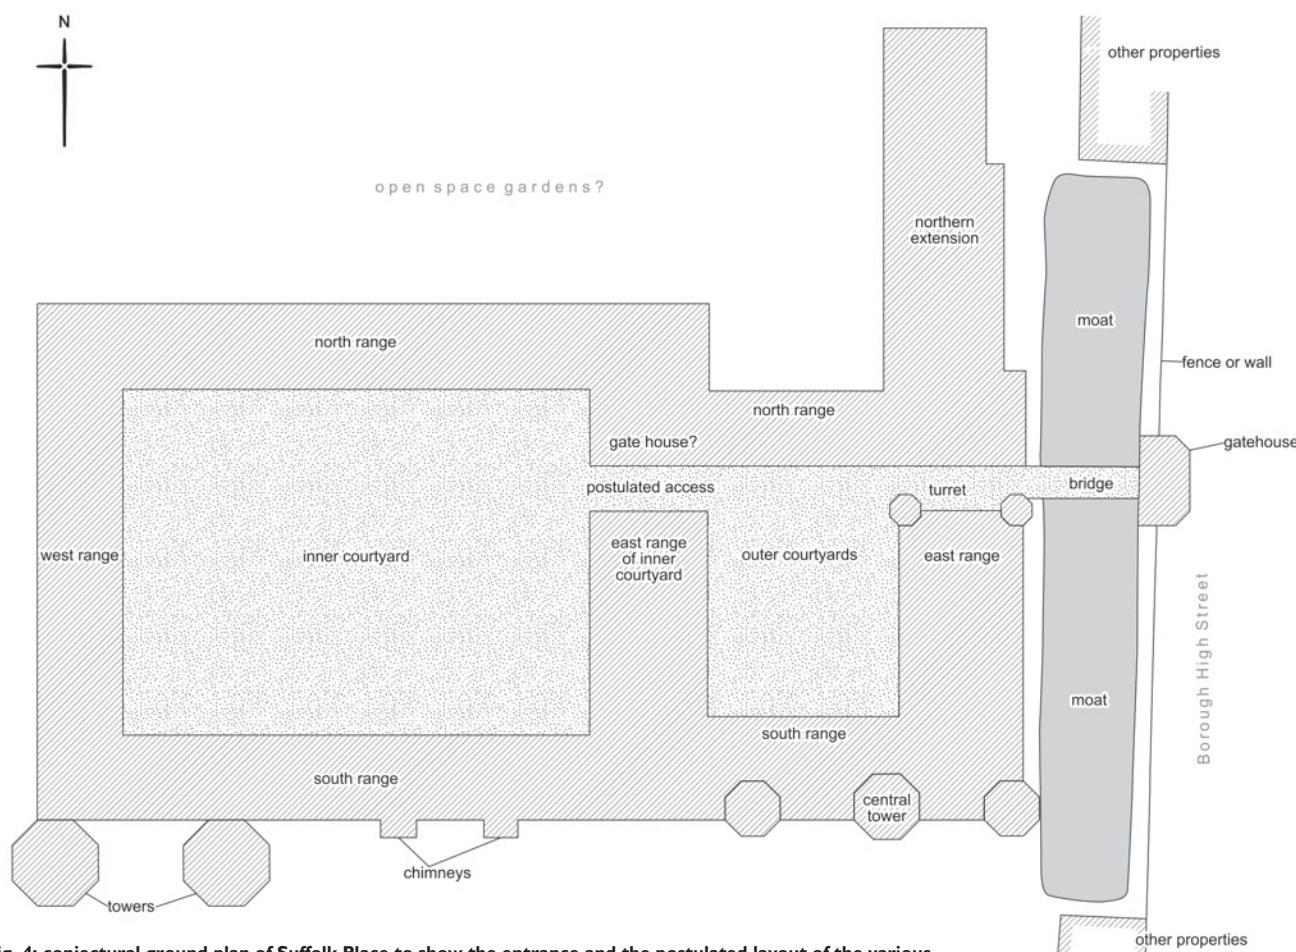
conjectural ground plan of Suffolk Place to show the entrance and the postulated layout of the various ranges of buildings (not to scale).
